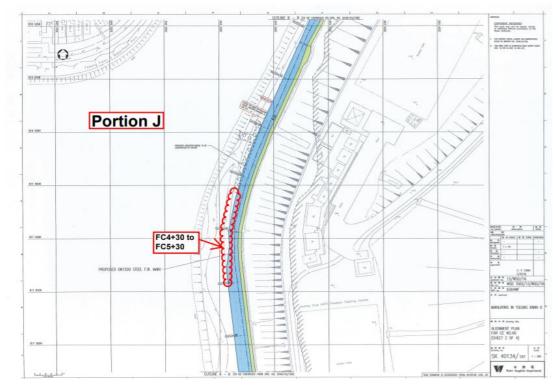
Location Plan – Landfill Stage 1 (Area FC4+30 -FC5+30)
